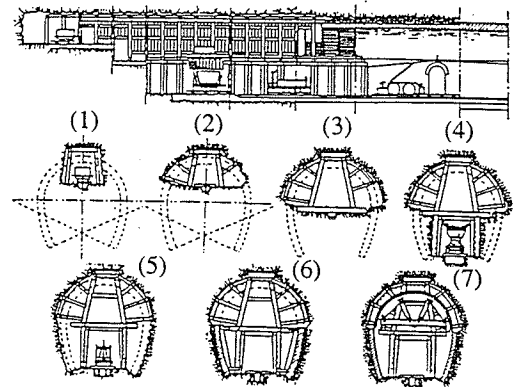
"Japanese" top drift method and Branch bar strut type timbering.²⁾
